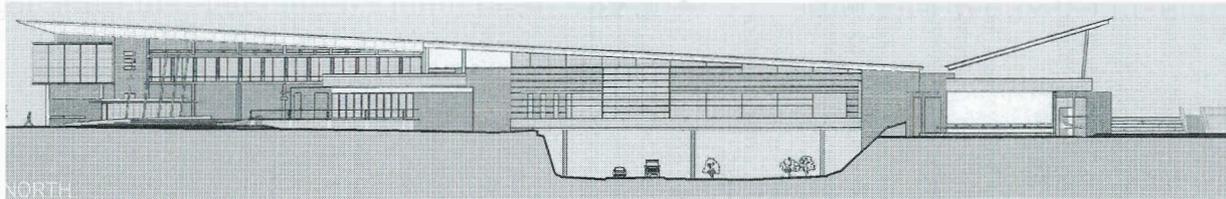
North elevation of the bridge building straddling DF Malherbe Avenue, five meters below (architects: The Roodt Partnership)
